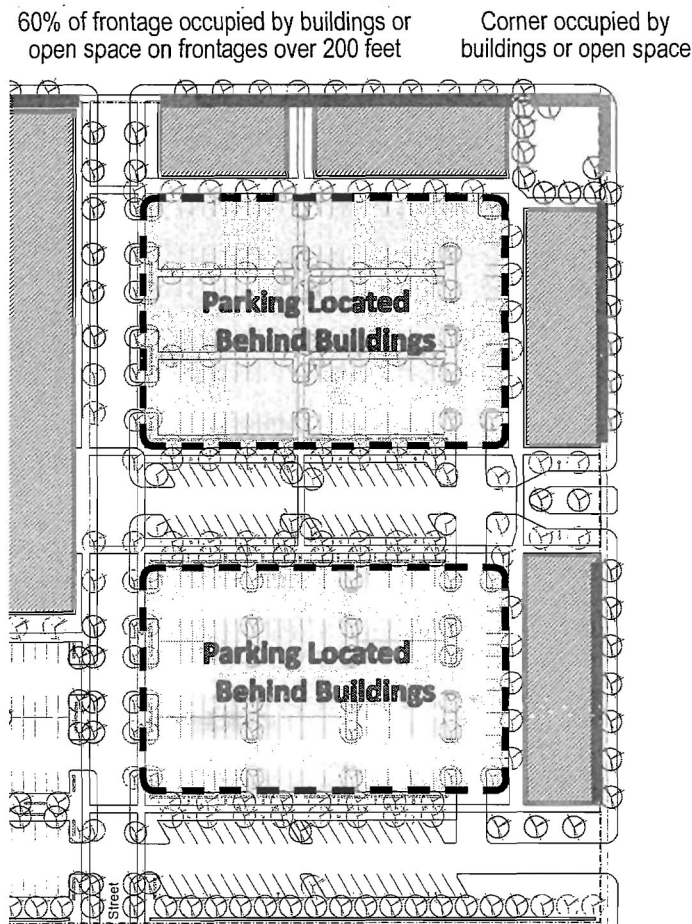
D.1.B: Open spaces located at the street may count toward frontage requirements.
